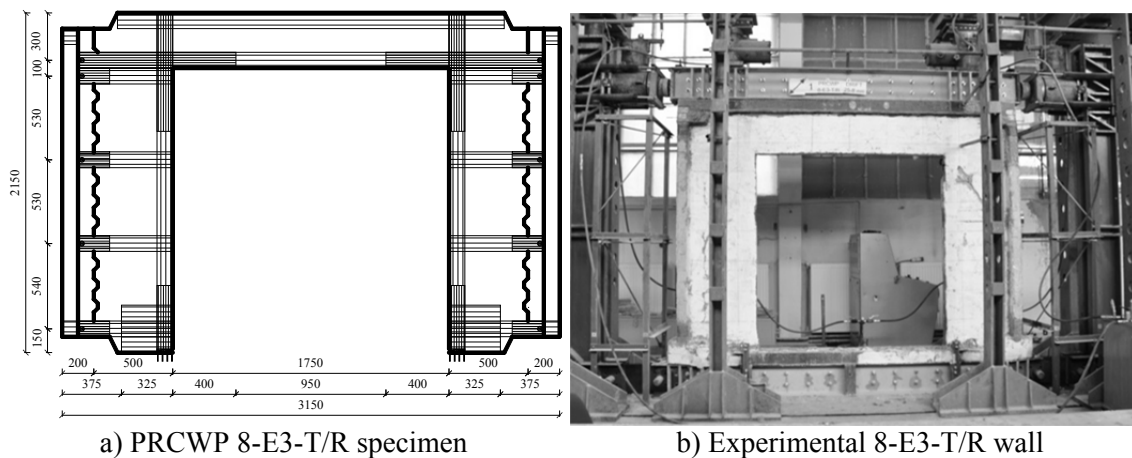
The strengthening layout of the precast reinforced concrete wall panel with narrow door opening [6].
